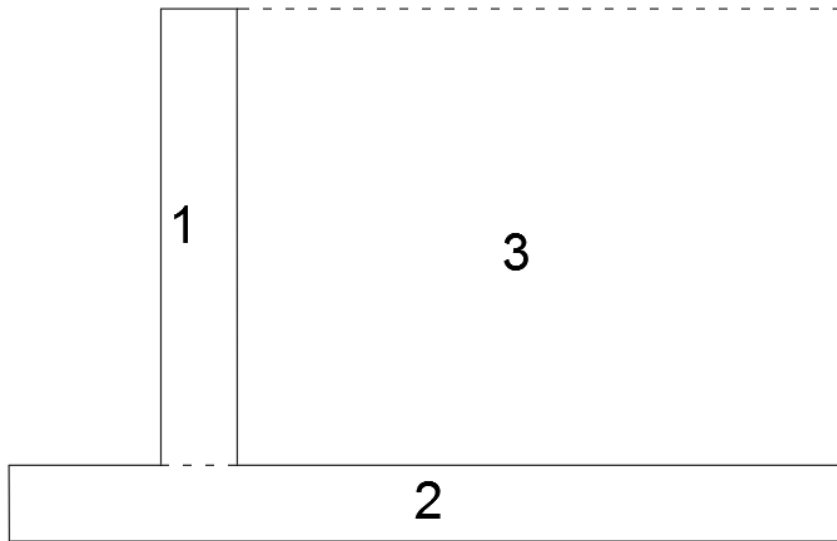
Diagram for stem part of Cantilever Wall (1), slab section (2) and backfill soil (3)
